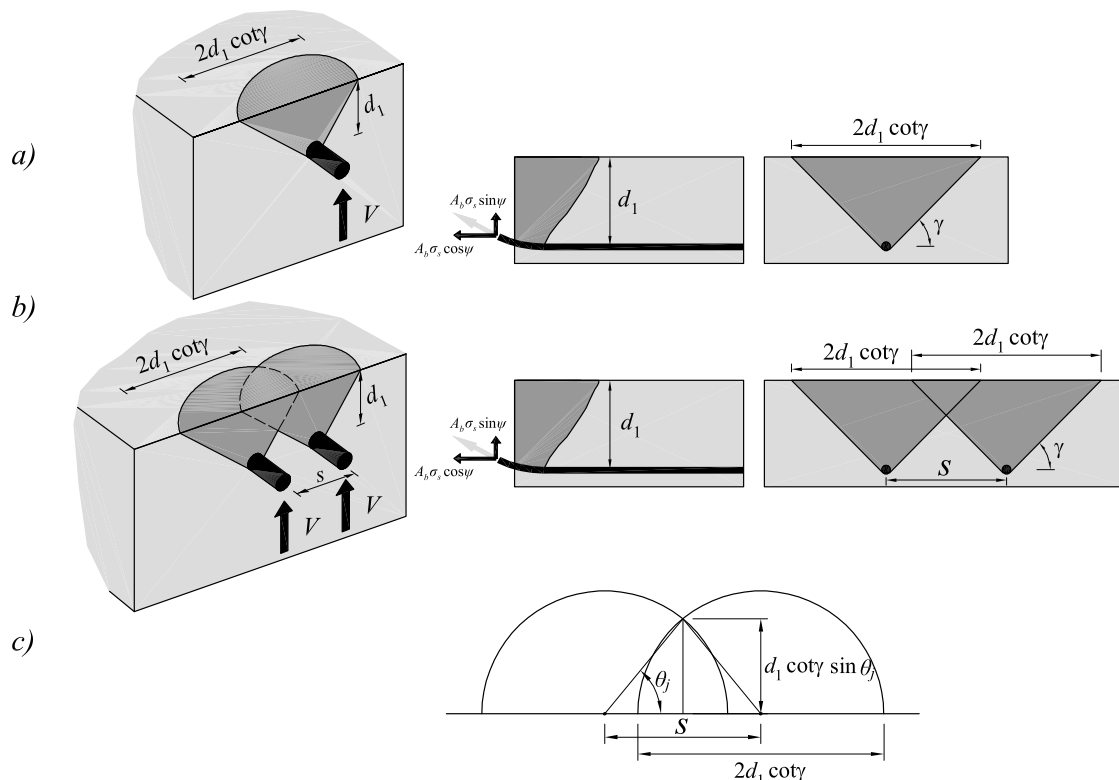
ACI model for concrete breakout strength: a) concrete breakout cone for a single reinforcing bar, b) concrete breakout cone for two reinforcing bars, and c) horizontal projection of the conical failure surface
